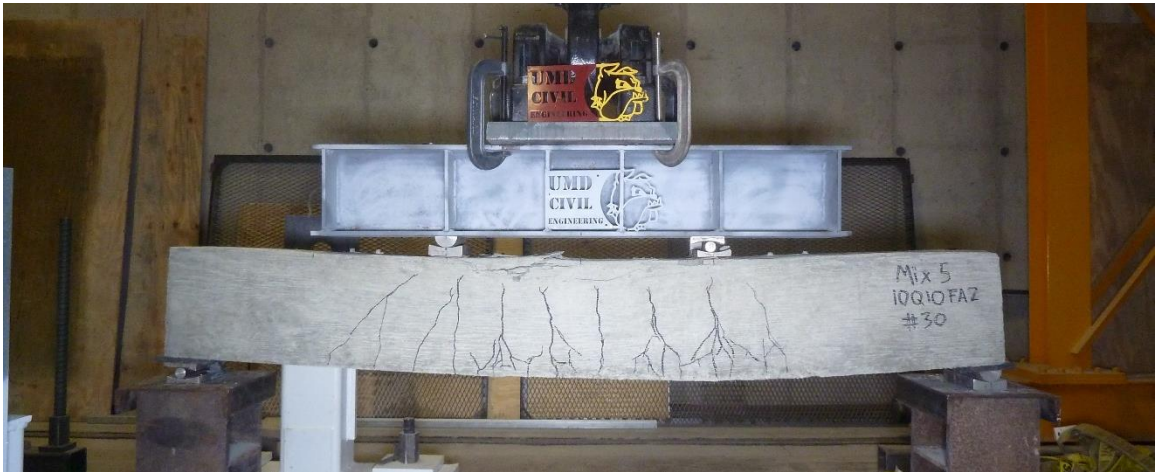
Mixture 5 (10Q10FA2) beam #30: concrete beam after testing.
